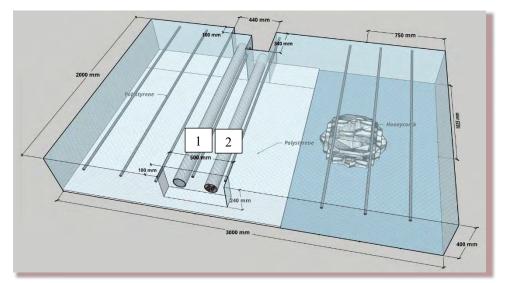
Geometry and dimension of test slab. 1) Empty duct. 2) Fully grouted duct. (Note: Thickness of slab wrongly stated to 400 mm, in reality thickness of the slab was 360 mm).
